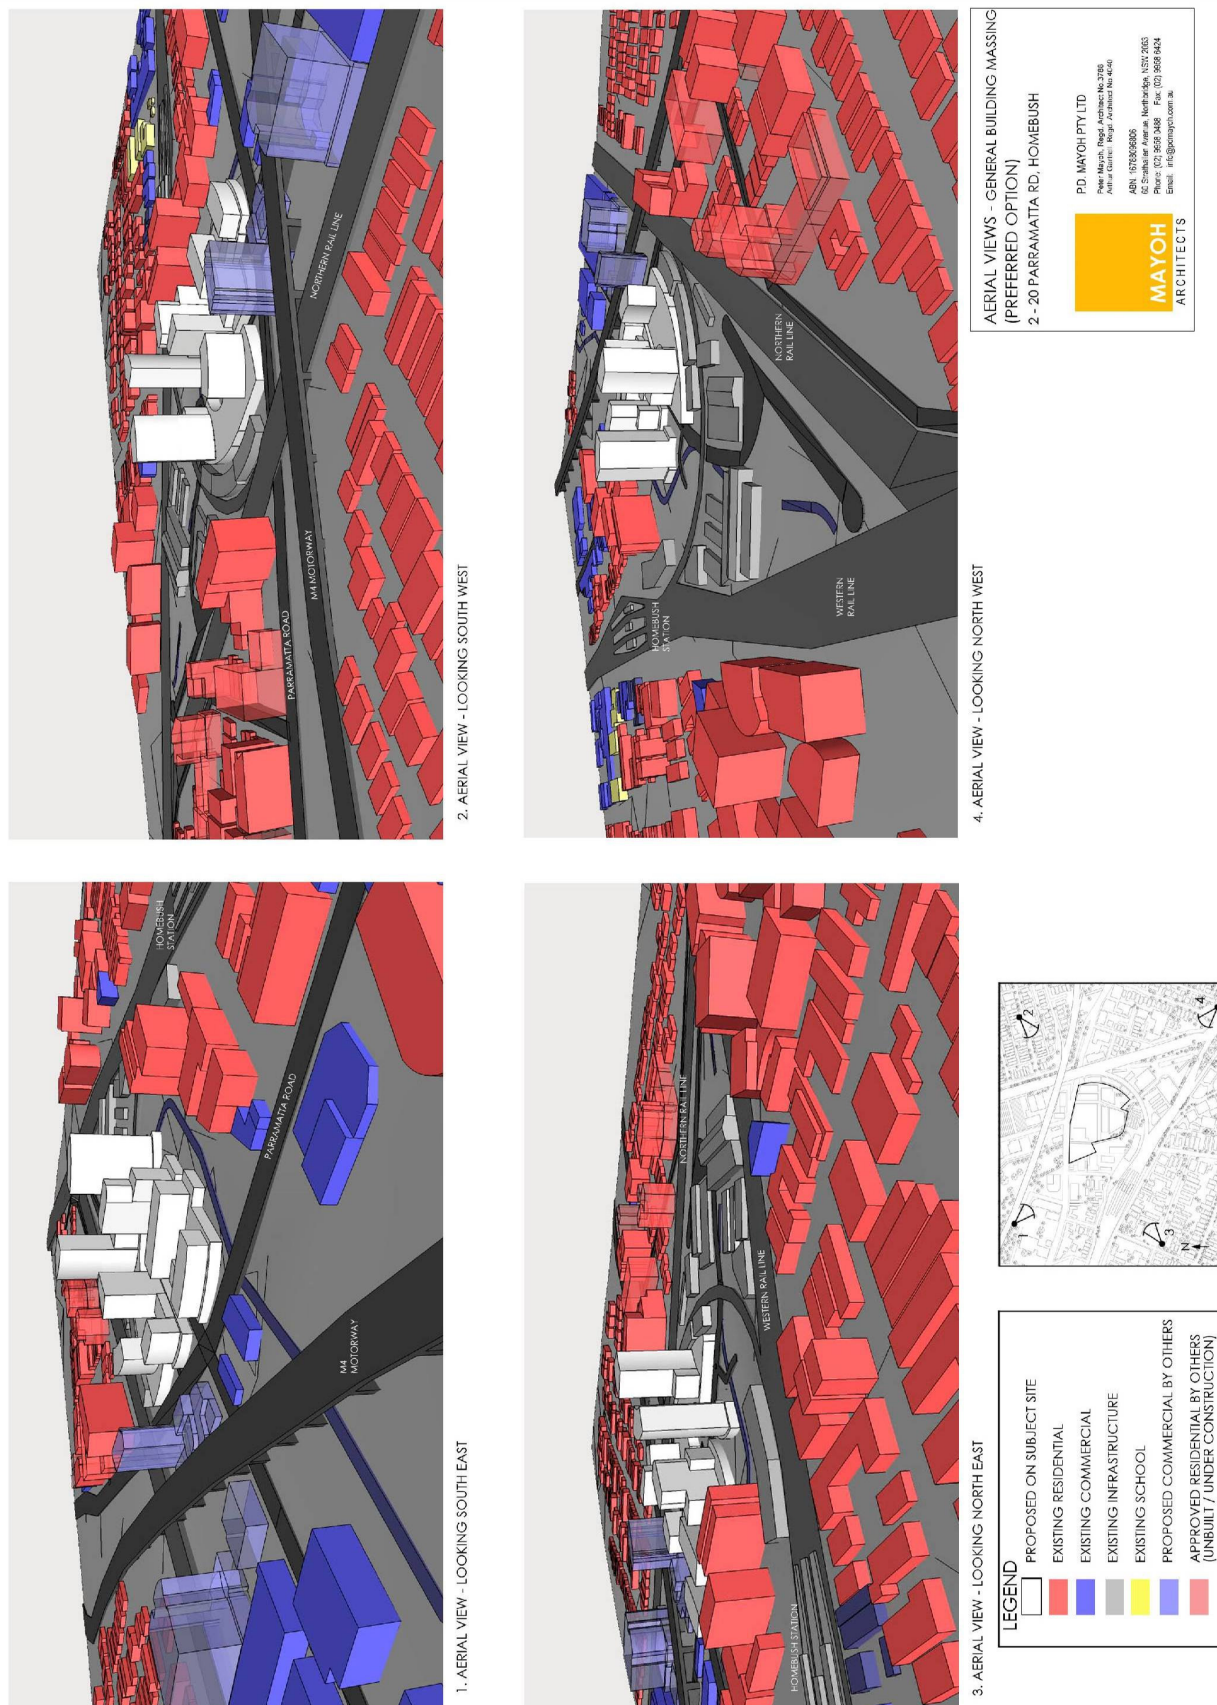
AERIAL VIEWS – GENERAL BUILDING MASSING
